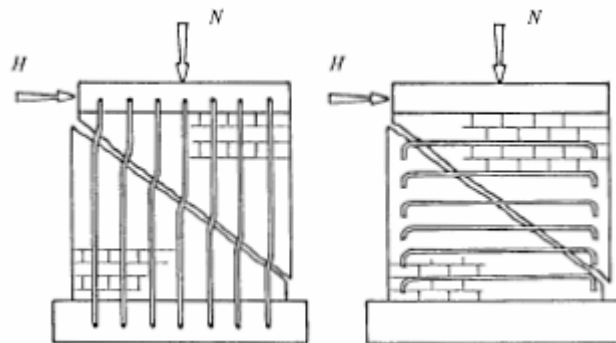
Influence of diffused vertical and horizontal reinforcement on the shear failure mode (after [10])
